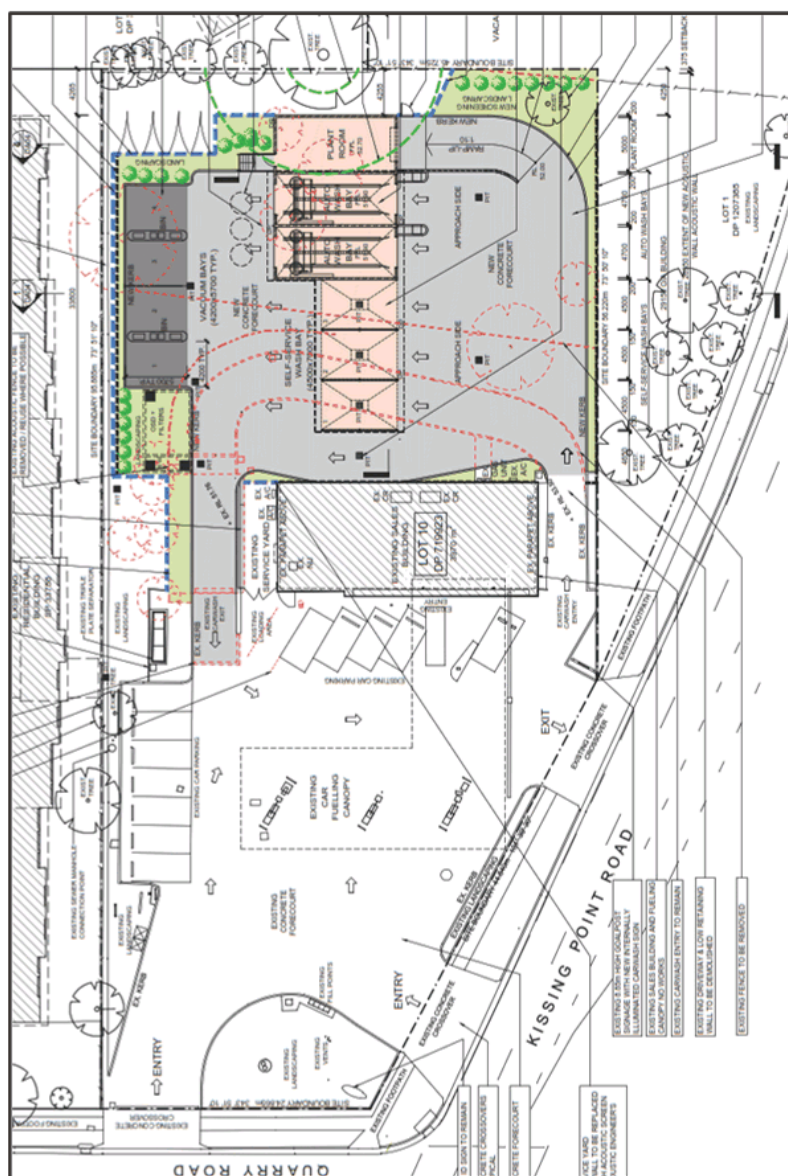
Extract of proposed site plan (Source: MCHP Architects, Drawing No. 19-085 DA01 Rev B)
